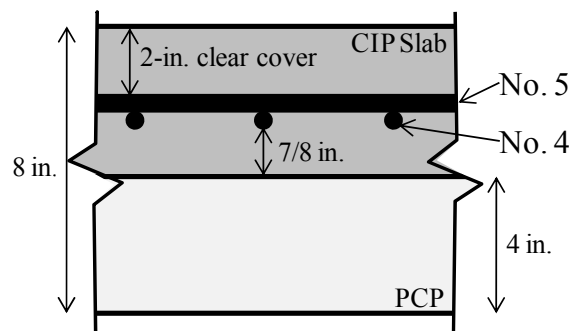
Section Dimensions for Typical 8-in. Deck
